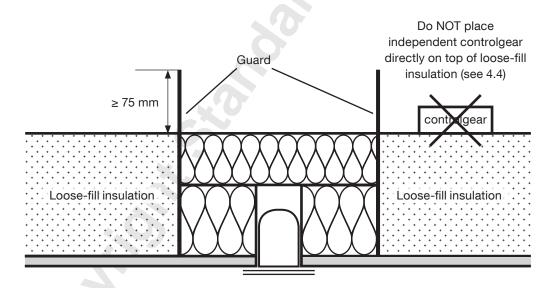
Installing new loose-fill ceiling insulation around recessed luminaires of the type IC, IC-F, and IC-4 where the luminaire manufacturer's instructions are not known
